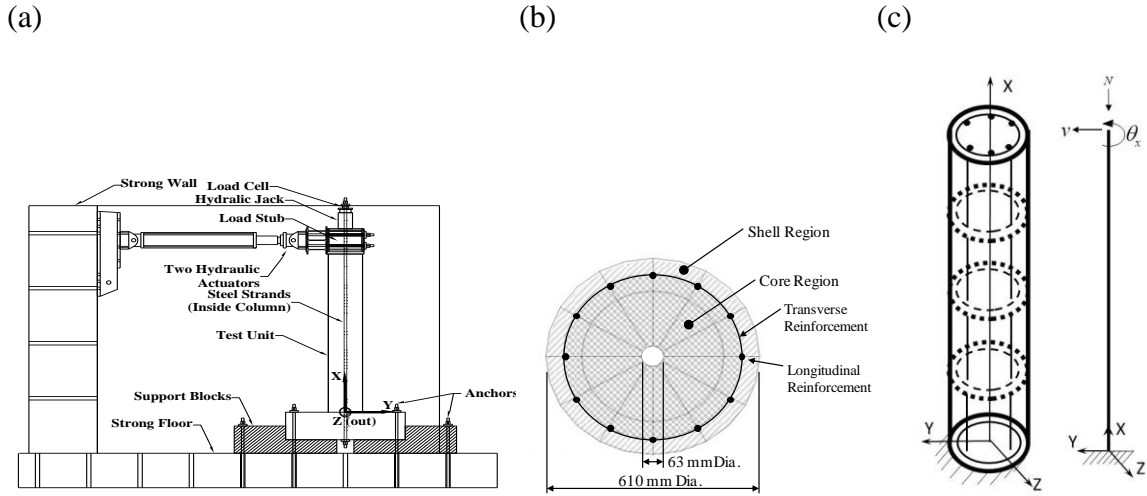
Bridge schematic view (a) Bridge column test setup (b) Bridge column section (c)
